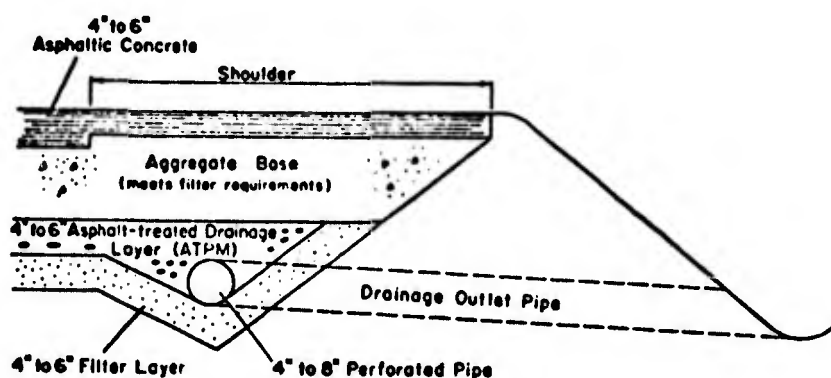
Two-layer drainage blanket for flexible pavement system (141).
